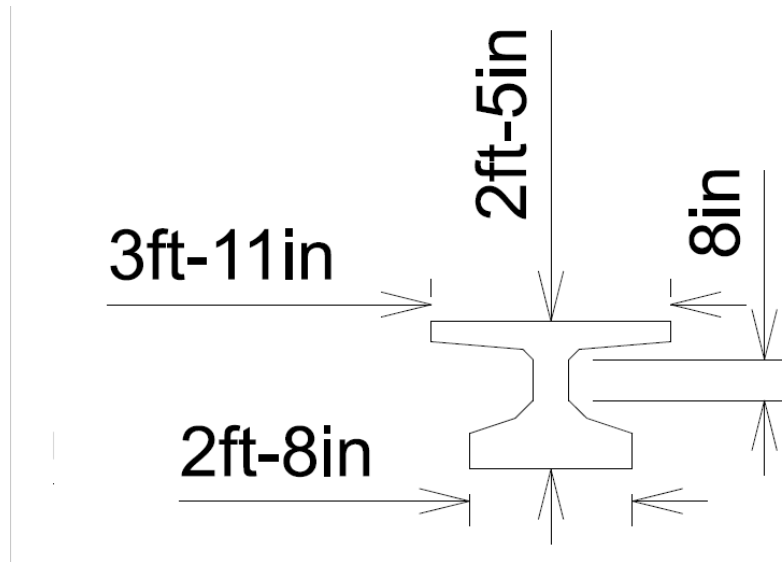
Typical Section of Proposed Structure's Beams - Prestressed Bulb-T PCBT-29
